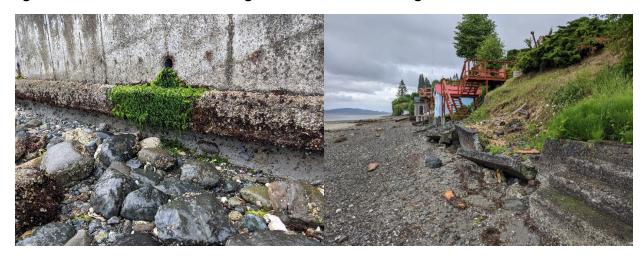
Observed undercutting of a seawall within the study area with consolidated till visible below concrete footing (left). Shallow landslide and failed retaining wall/seawall (right).
